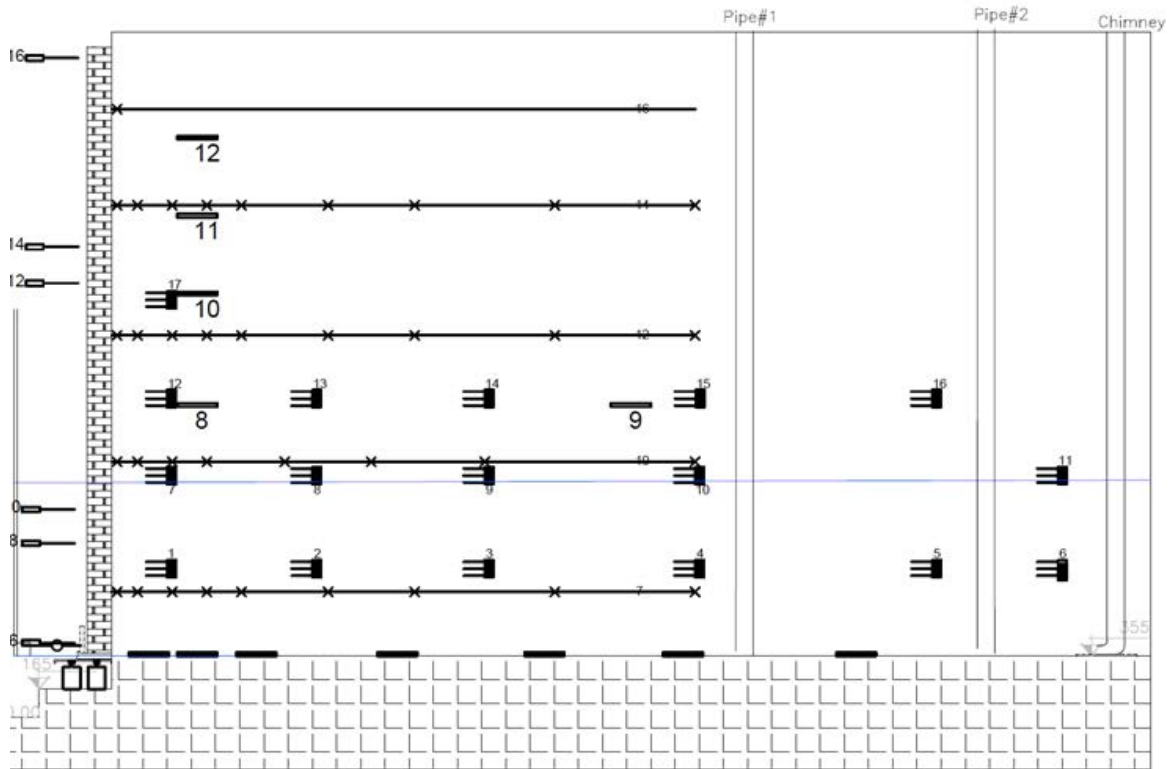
Wall #2 cross-section displaying instrumentation location.
